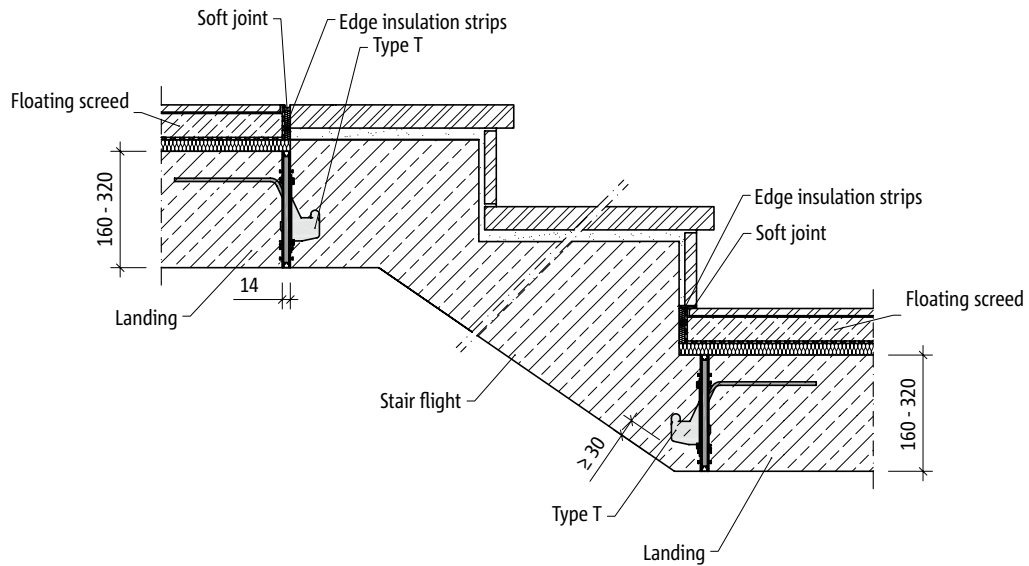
Schöck Tronsole® type T: Installation cross-section
